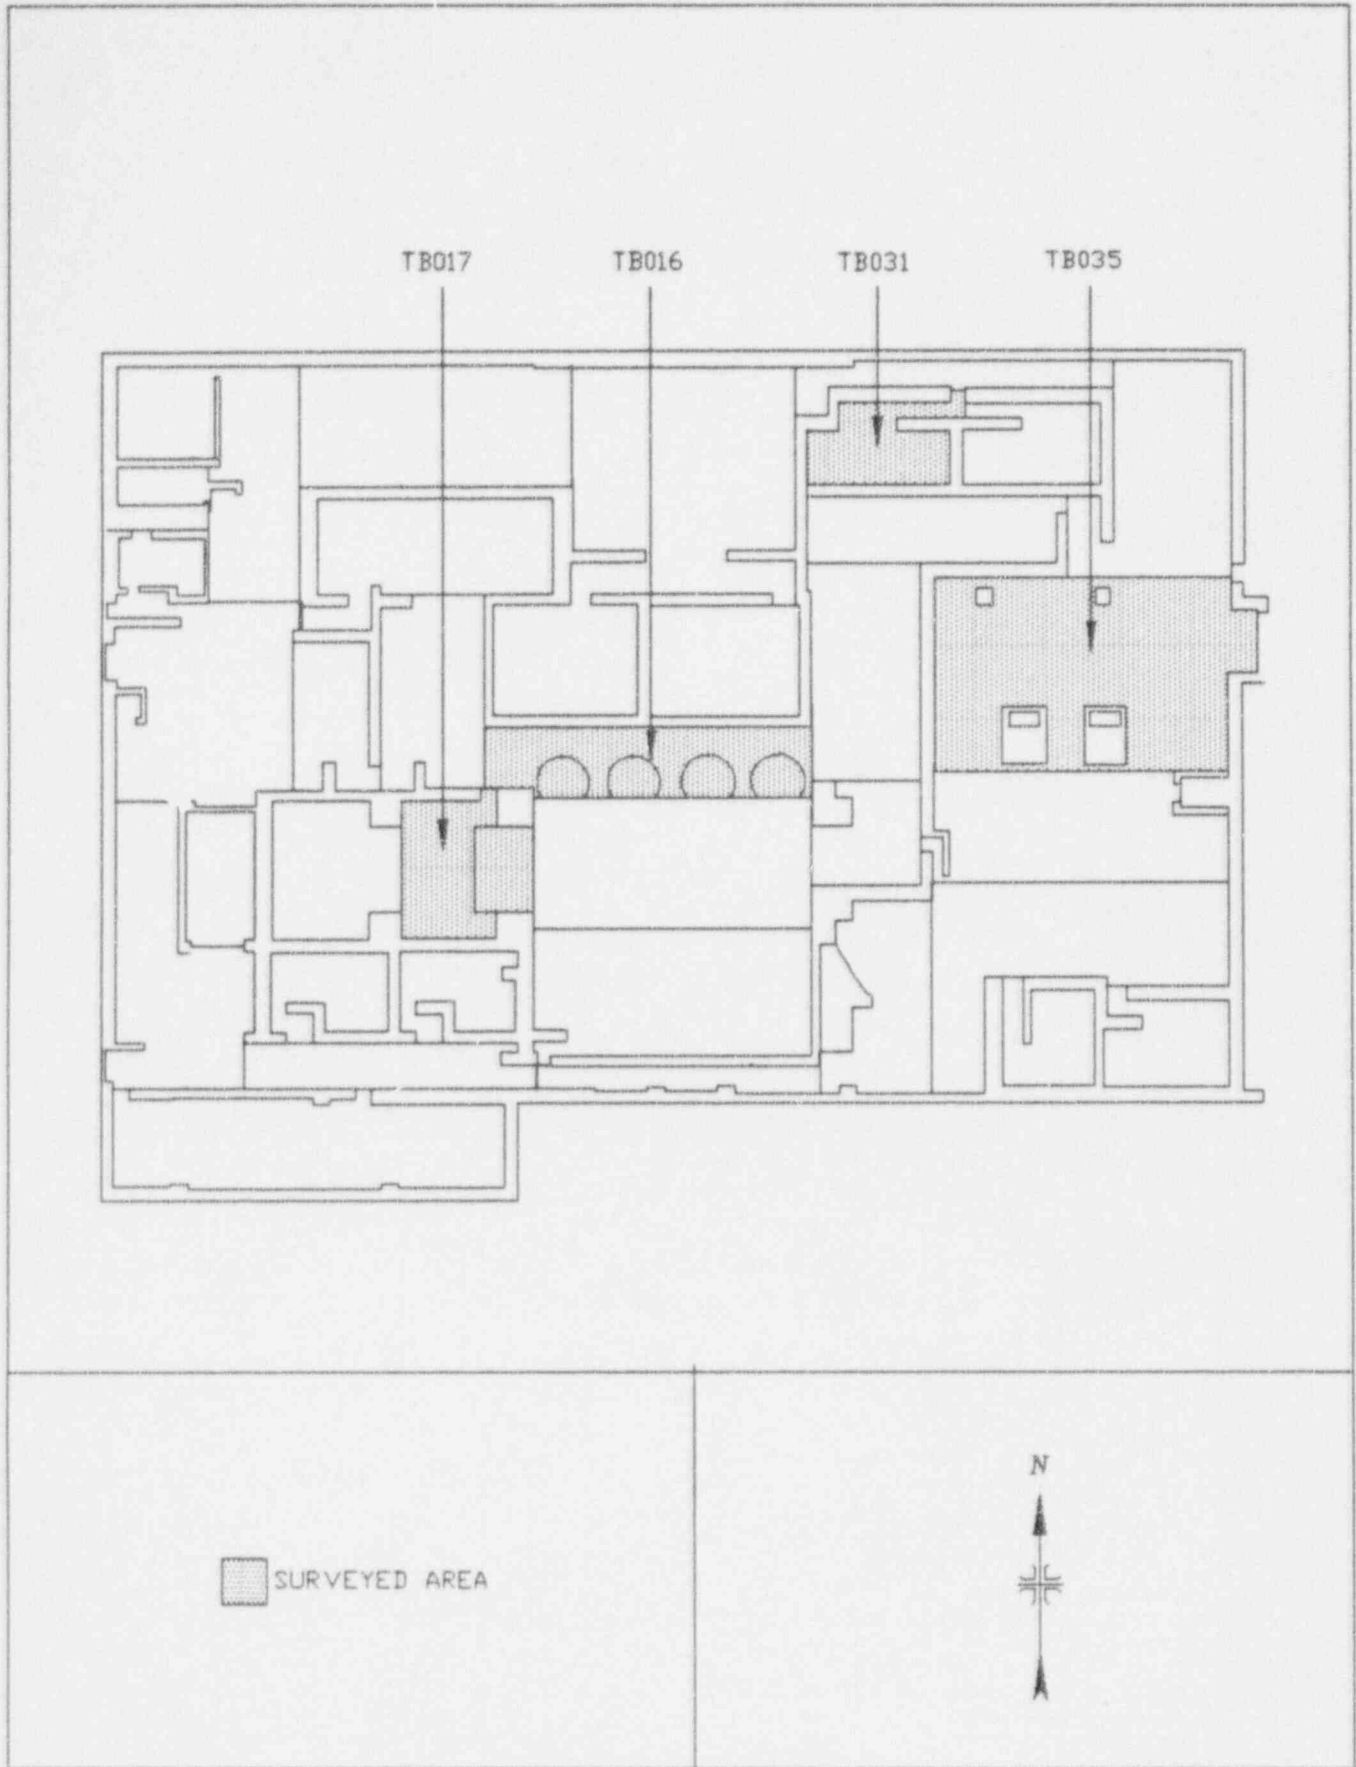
Turbine Building, Elevation +5' - Floor Plan and Areas Surveyed
